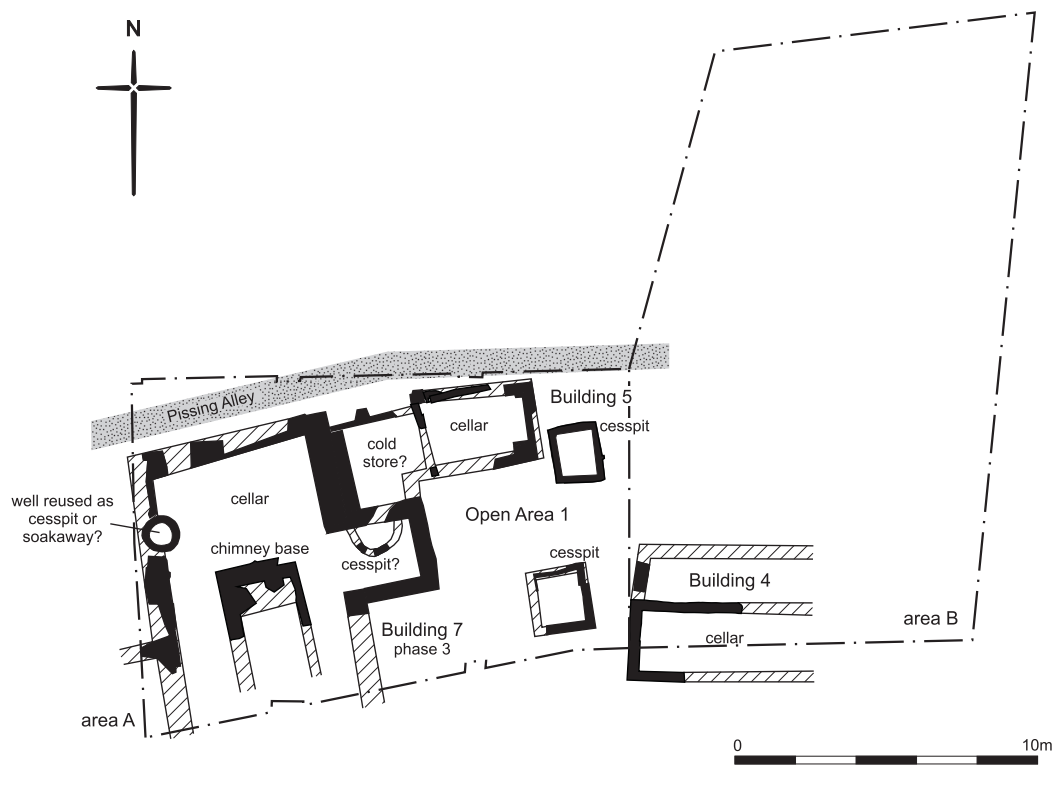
Plan of the buildings at SAJ98 in c.1700 (scale 1:250)
